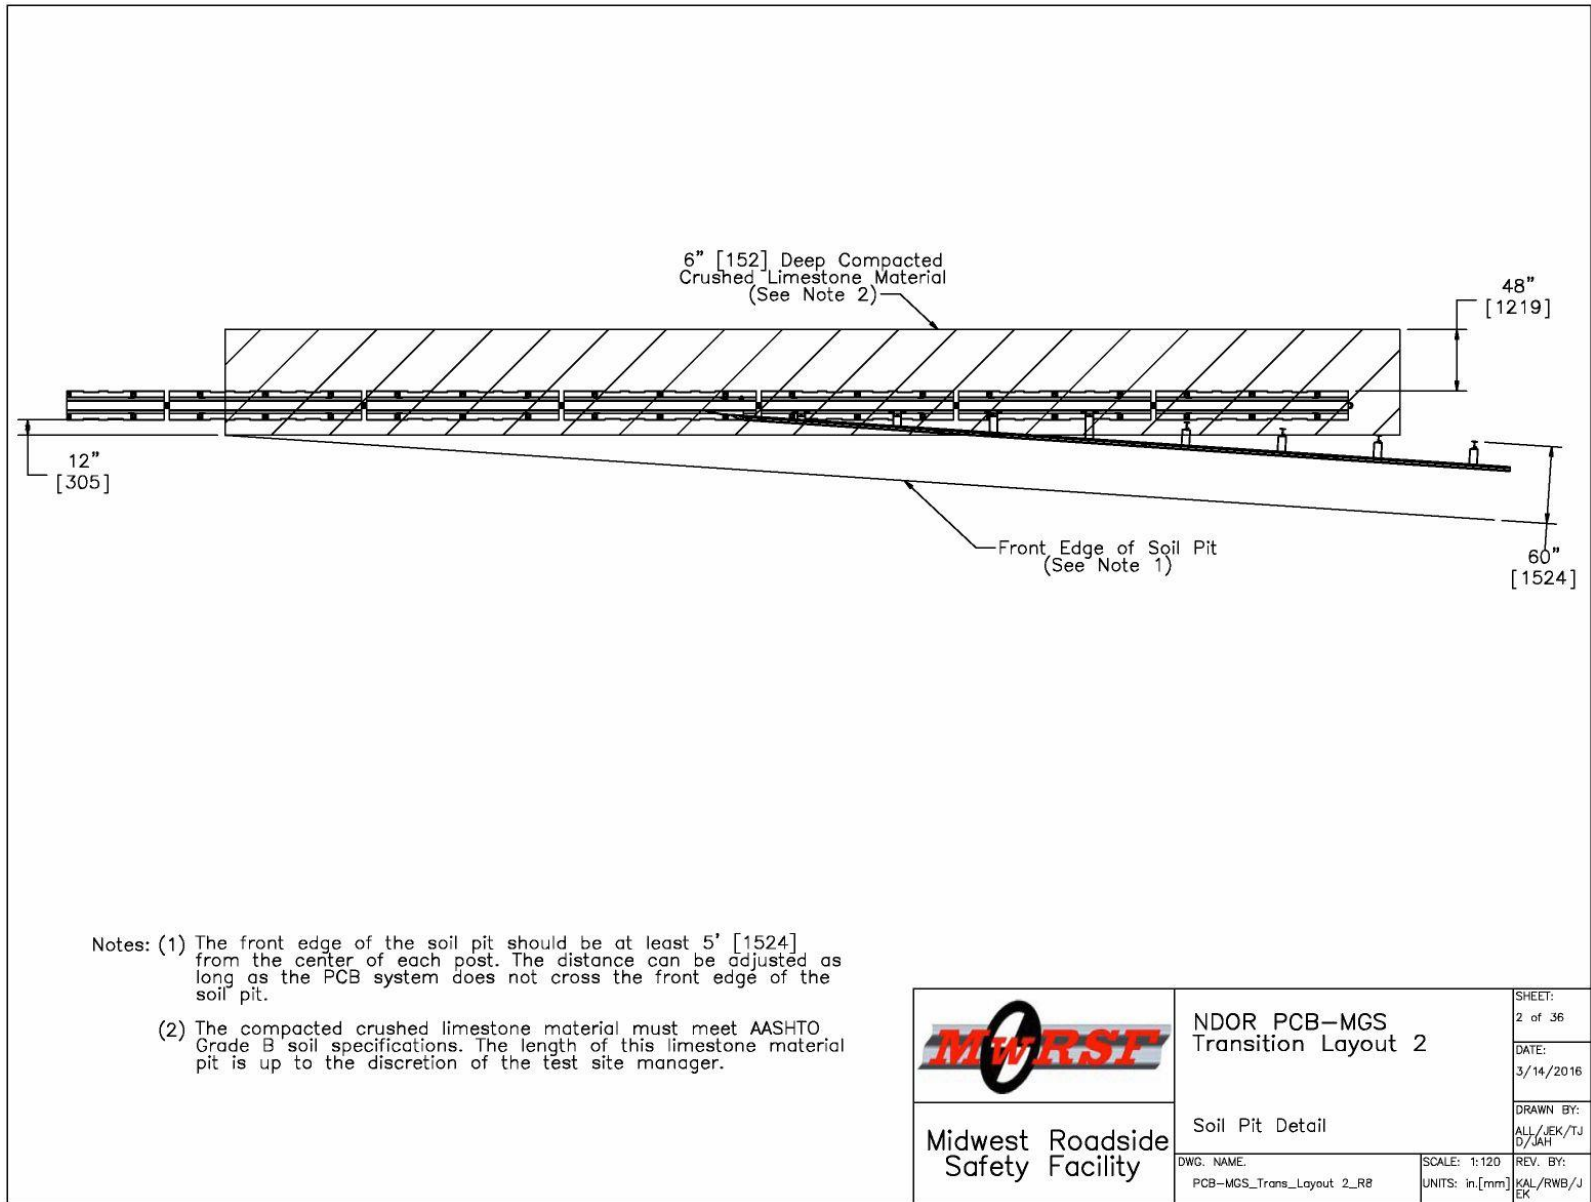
Soil Pit Detail, Test No. MGSPCB-1
